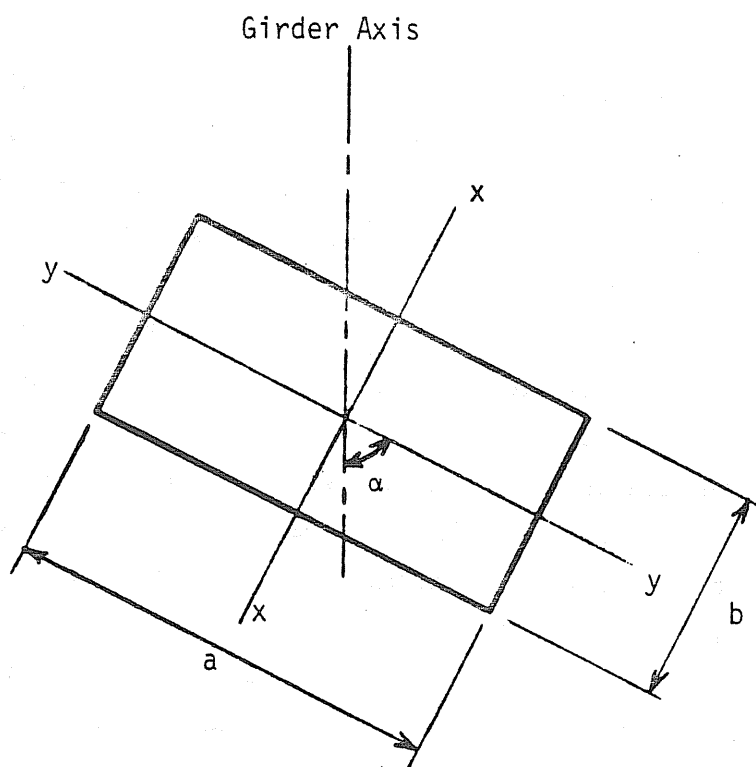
Bearing Parameters for the Turned Shear Axis Tests
